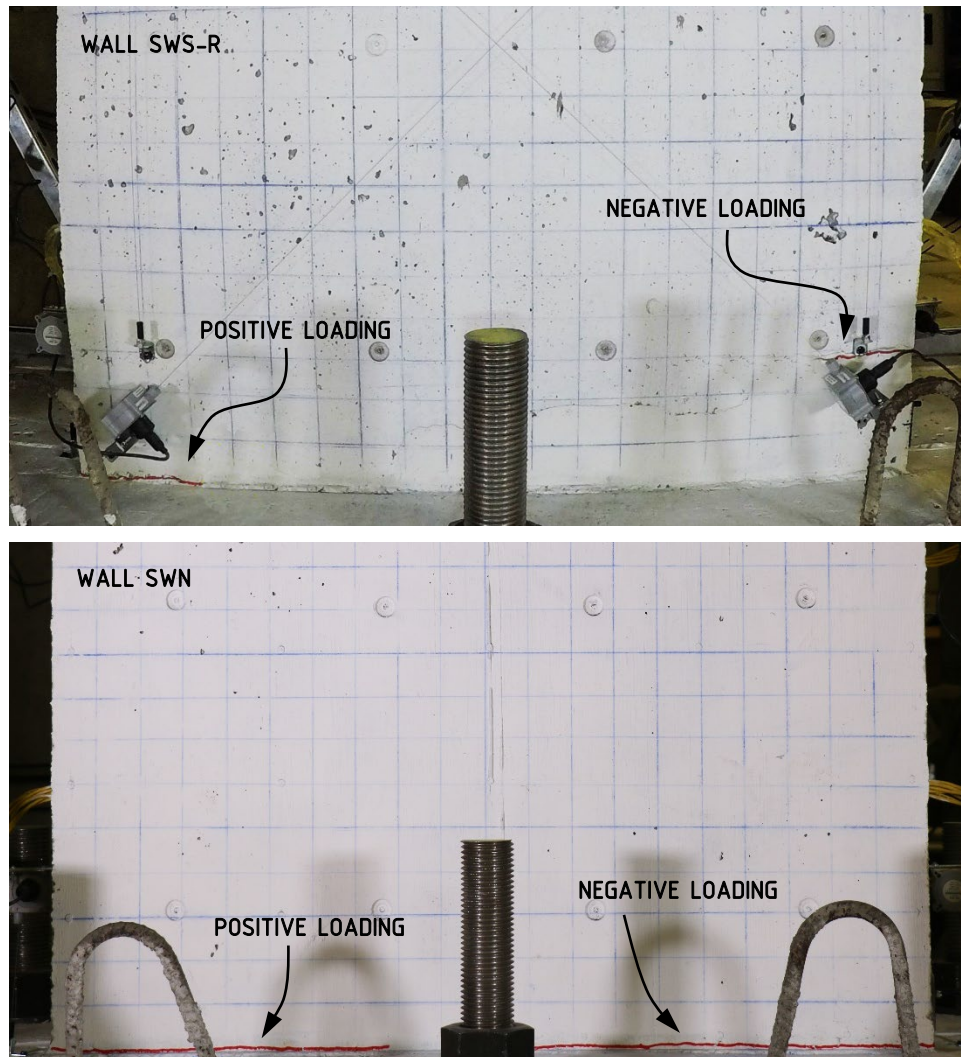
First flexural cracks on walls SWS-R (top) and SWN (bottom).
